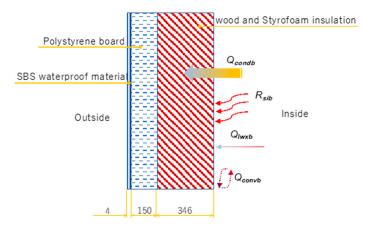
Heat transfers in the greenhouse back roof (unit, mm).
